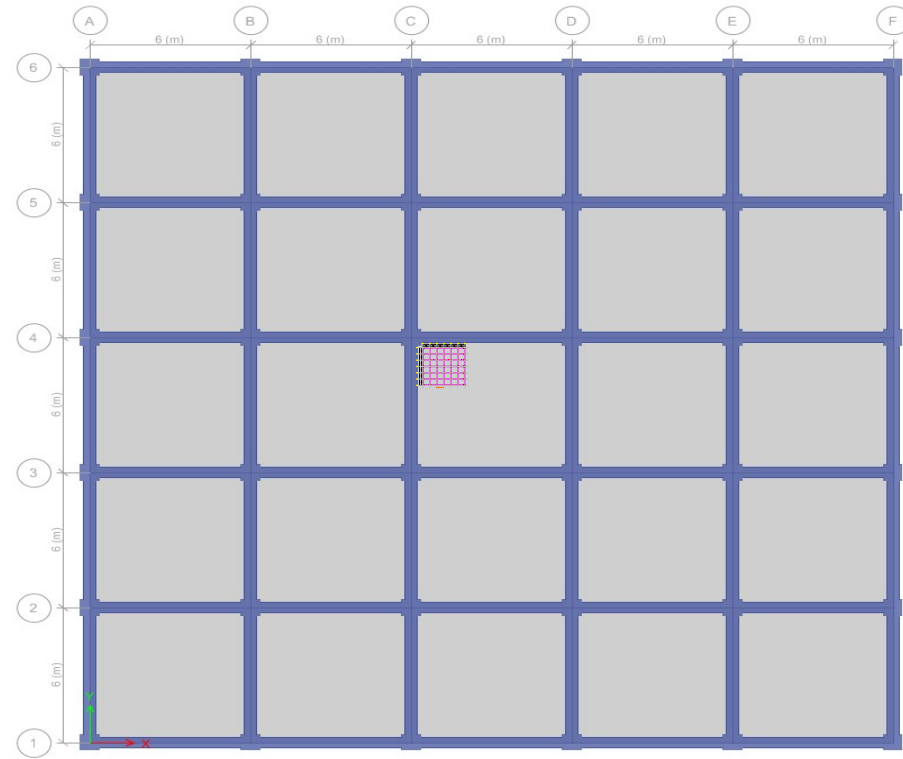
Plan at Typical Level of Building (Showing Arrangement of beam and columns)
